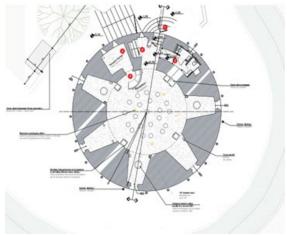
Existing situation, ground floor plan Source: EU4Culture official website
